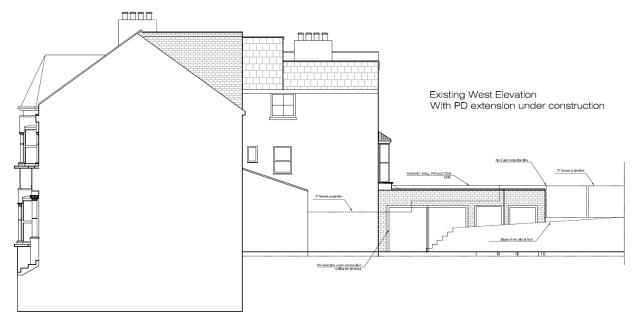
3 Hillfield Road Existing West elevation with PD extension (under construction)
